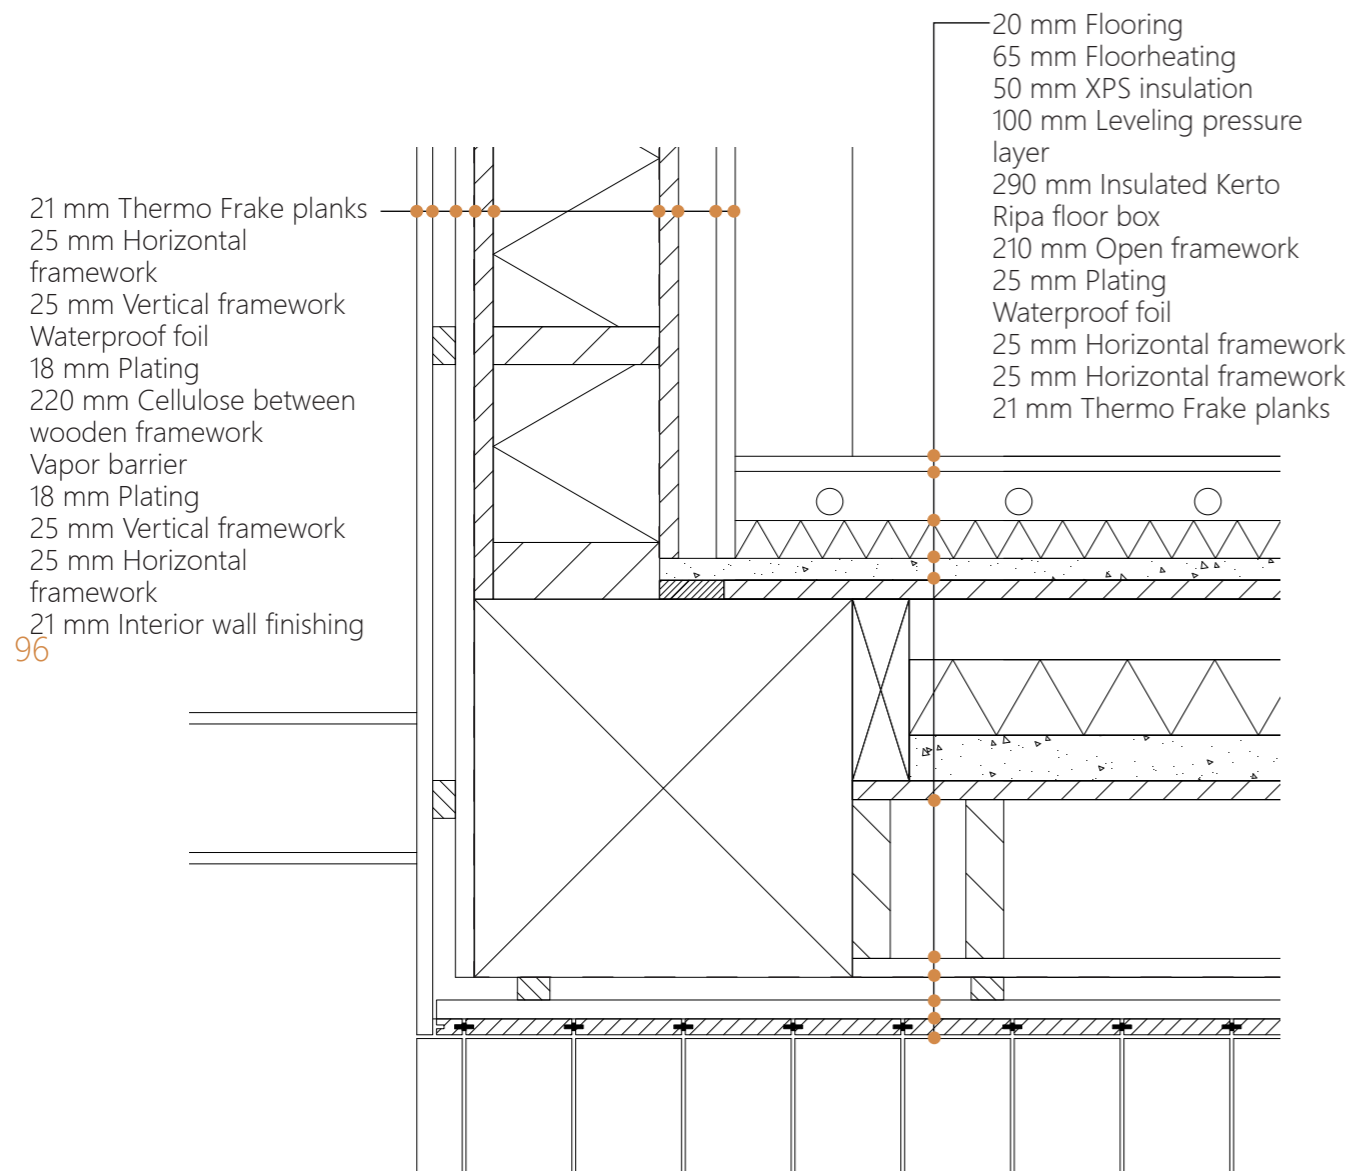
VERTICAL MEZZANINE FLOOR 1:5 (SCALED 50%)
